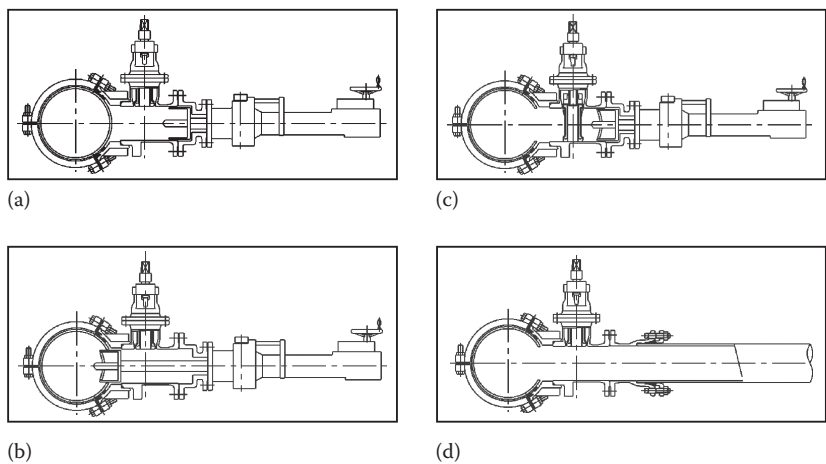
Example of non-water-stopping method (in the case of branch pipe installation). (a) Setting the drilling machine (set gate valve and drill machine to the main pipe, then open the gate valve); (b) drilling; (c) completion (pull out the drilling machine and close the gate valve); and (d) restart the water service.
